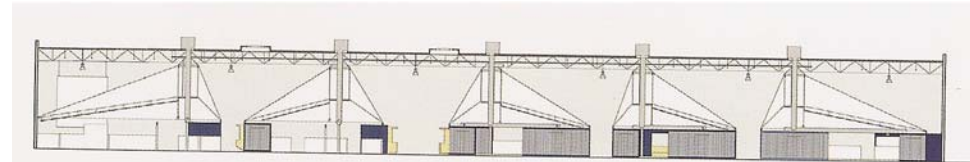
This section of the building (the lower portion of the plan below) has tensile structures anchored onto the containers
